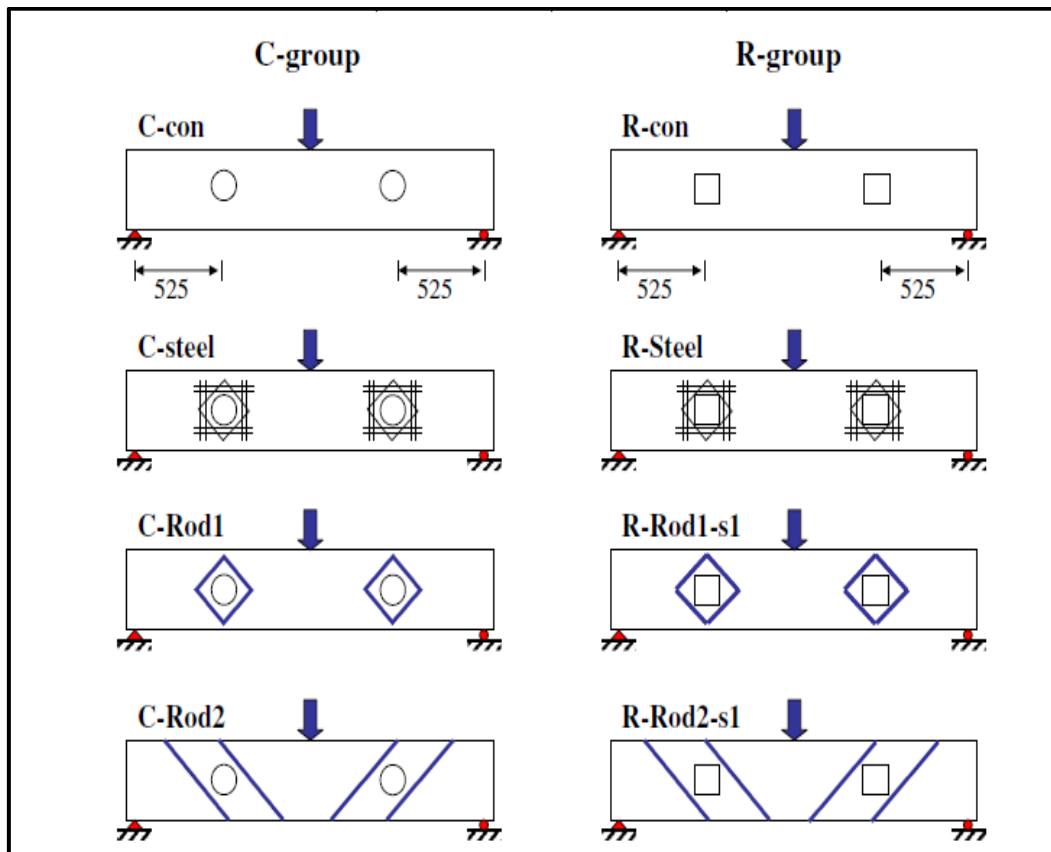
3: Specimens group of strengthening beams tested by Pimanmas, (2010)
